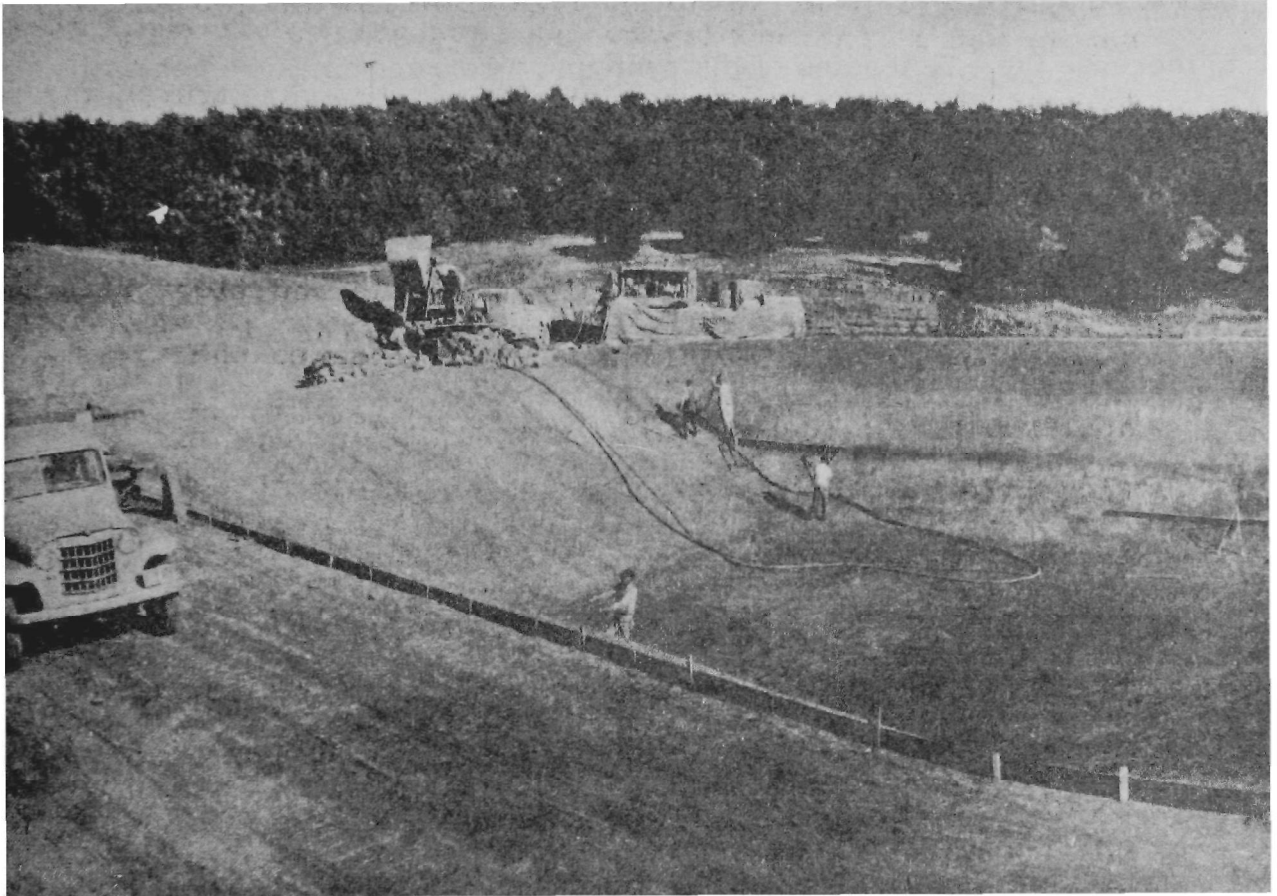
Irrigation Storage Reservoir Being Lined With Air-blown Concrete. Sealing The Walls and Floor of The Structure Virtually Eliminates Seepage Losses.
